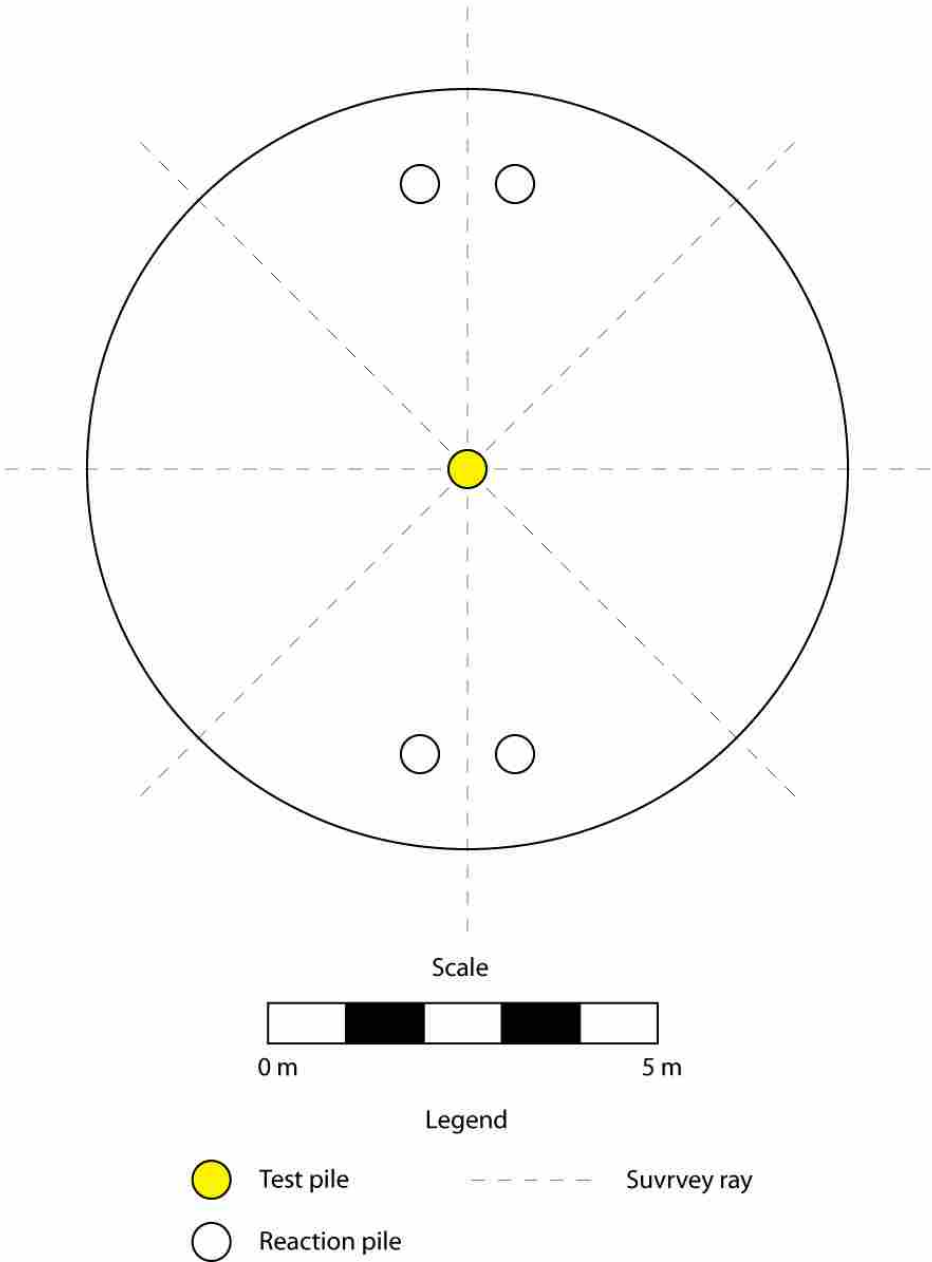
Plan view of pile foundations installed at both Sites 2 and 3.
